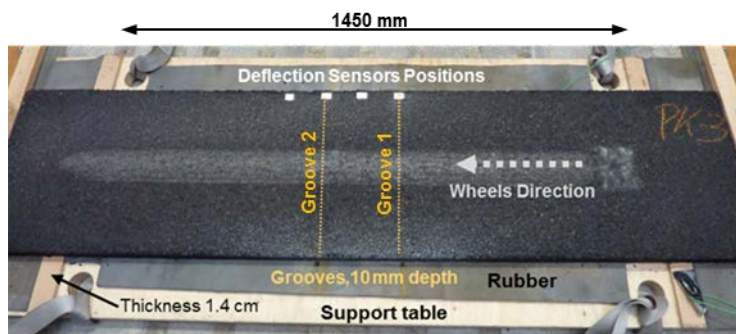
Detail of the asphalt slab (after loading) in the experimental setup.
